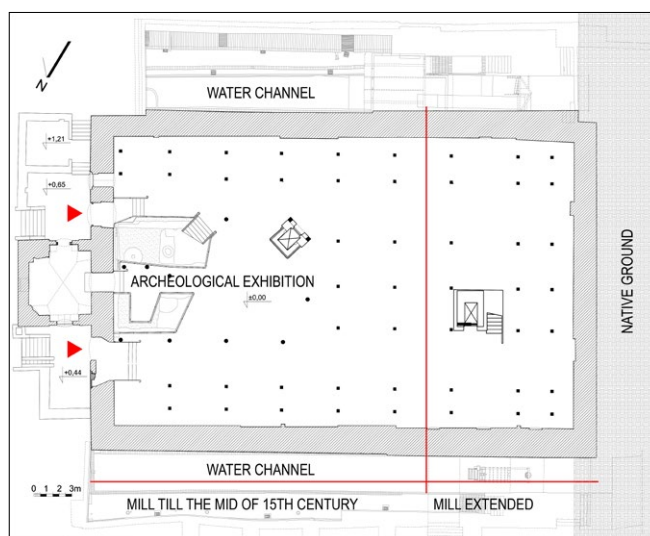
Contemporary Mill: floor plan with medieval and later structural divisions; by the author
